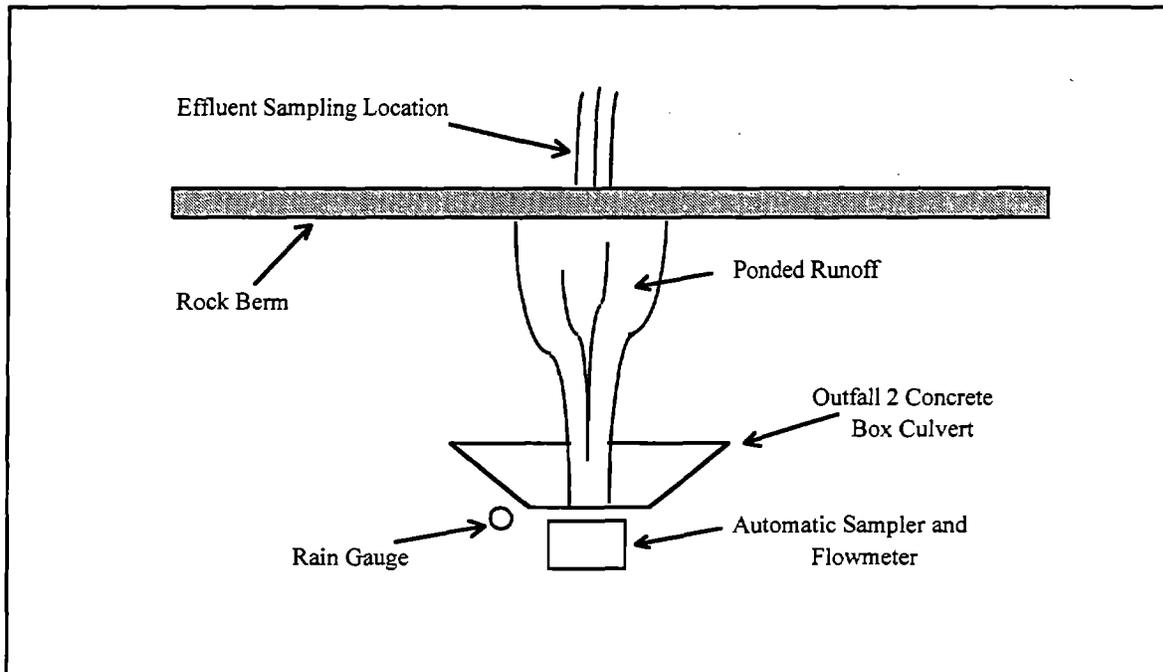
Plan View of Outfall 2 Rock Berm and Sampling Equipment
